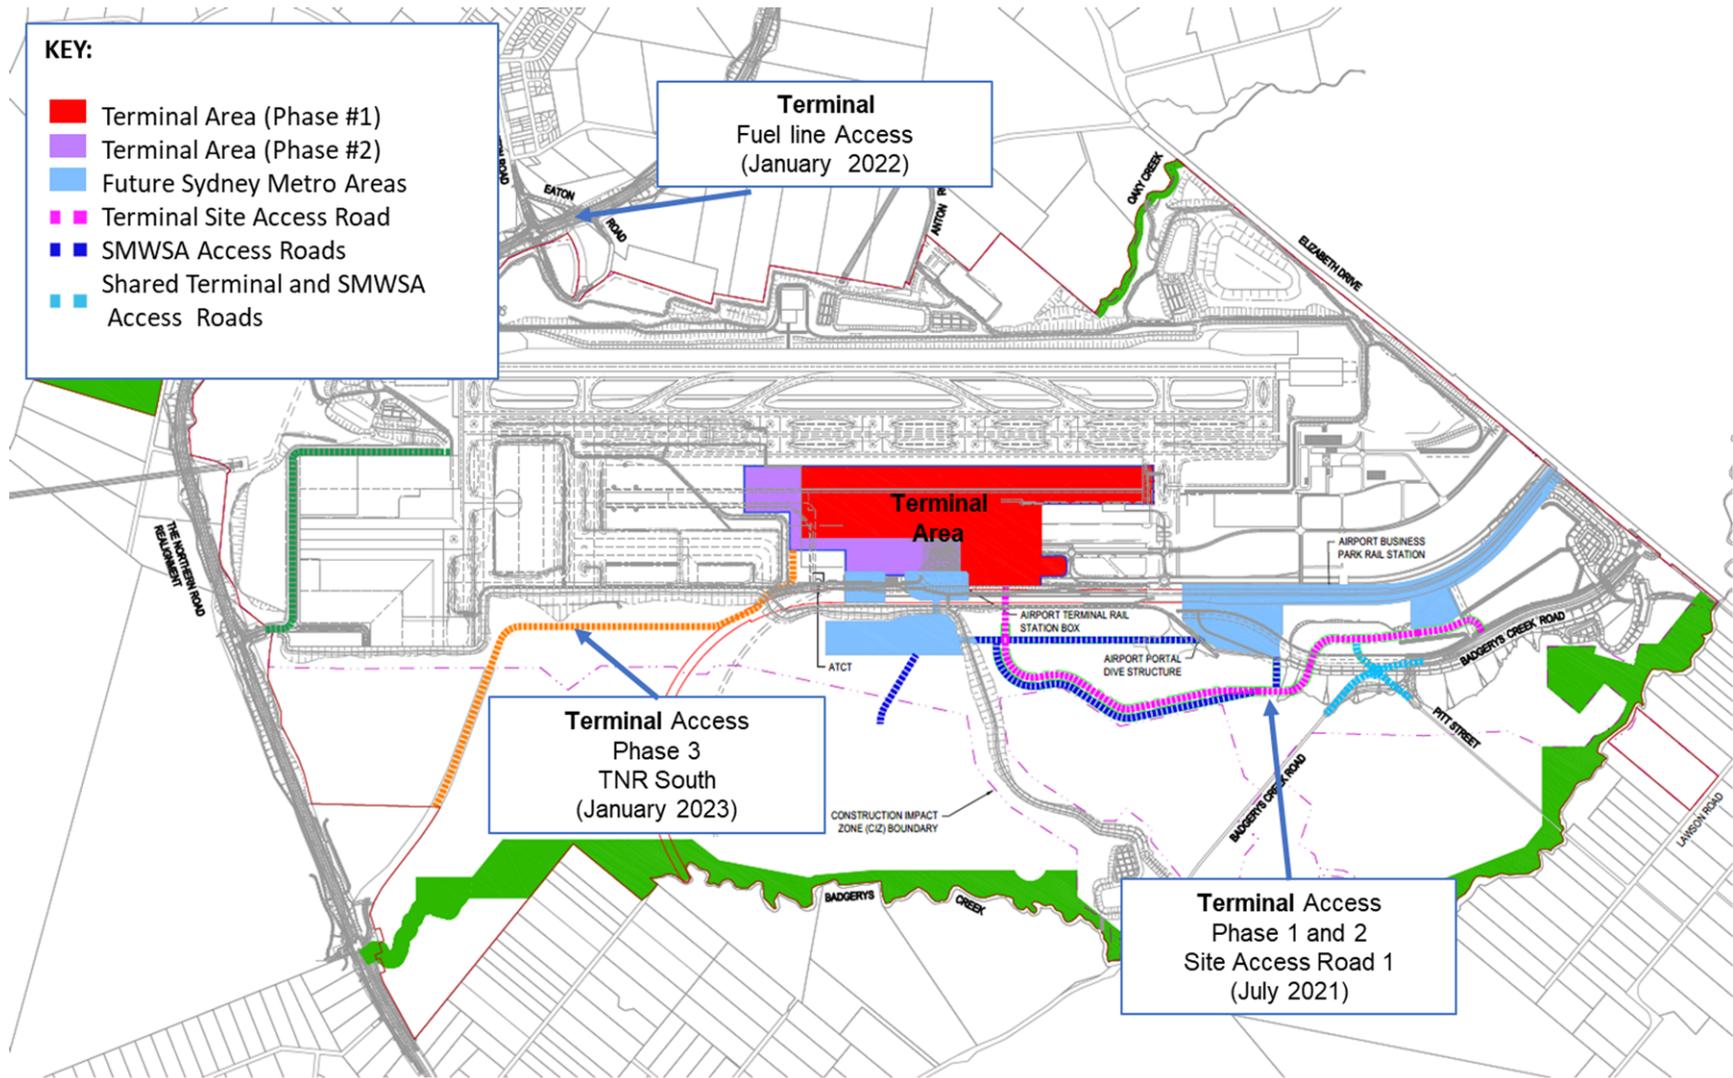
Proposed Terminal and Specialty Services Works Construction Access
